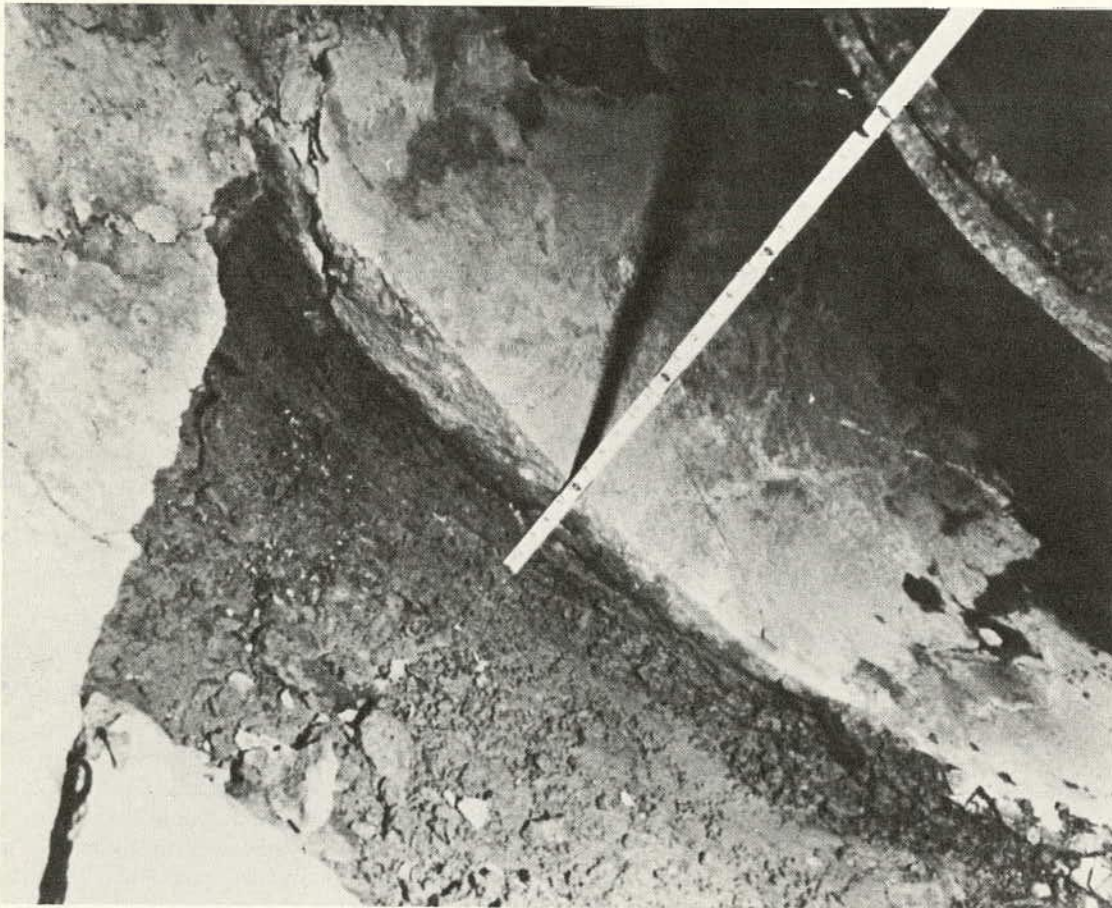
Pipe removed to show distribution of grout (Case 4).
